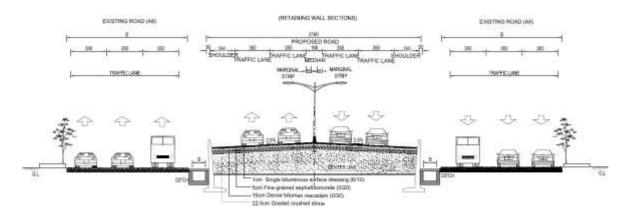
Standard Cross Section (21.6m) of Roadbed of Section with Retaining Wall
